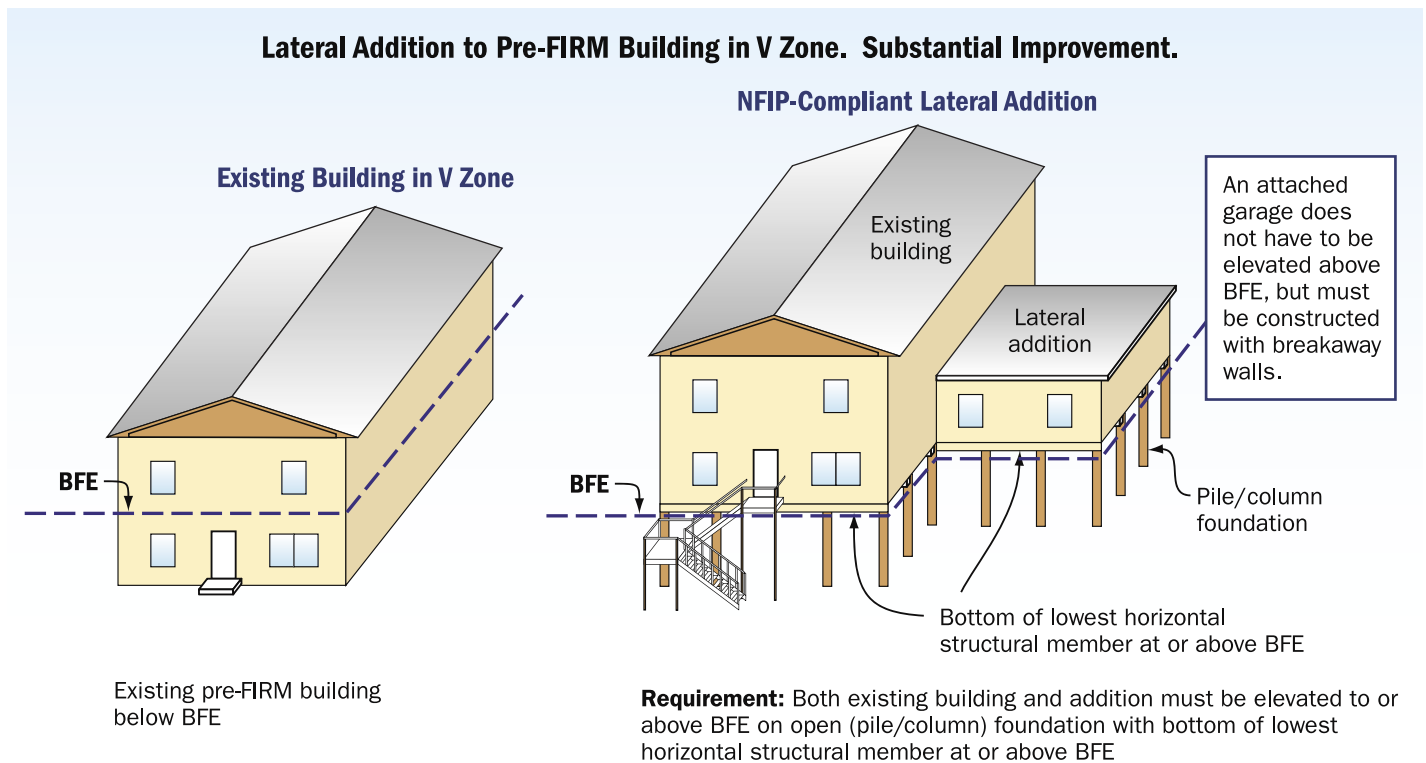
Substantial improvement: Lateral addition to a pre-FIRM building in a V zone.
